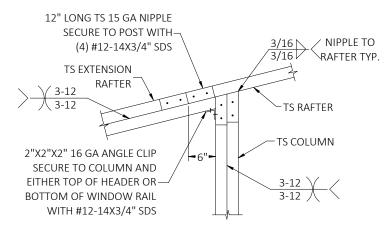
A SIDE EXTENSION RAFTER/COLUMN CONNECTION FOR RAFTER SPANS LESS THAN 12'-0"
